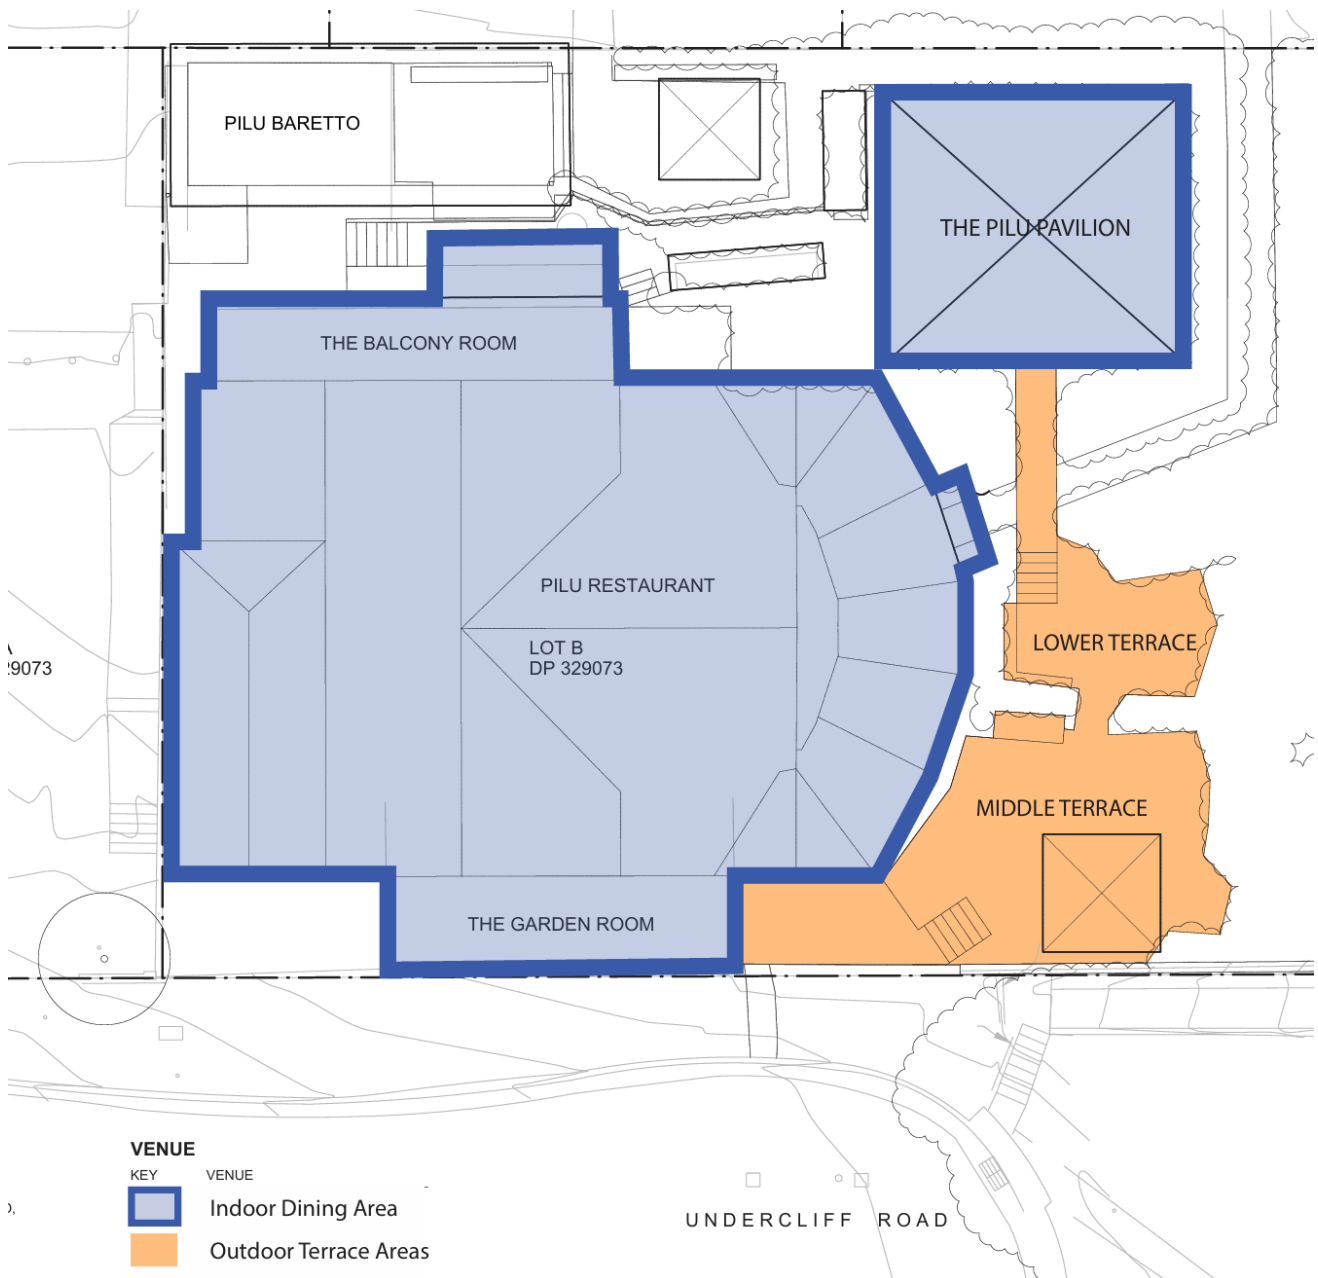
Site Plan for Amplified Music Areas (Source: McIntosh & Phelps Architecture)
